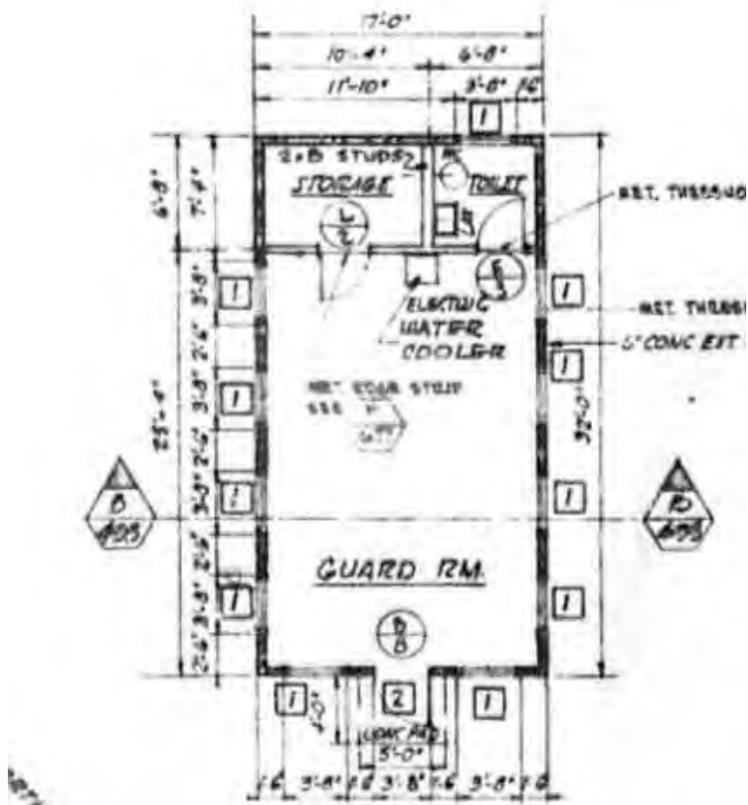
As Built plan view of the NTTU guard building, Feature 2.
